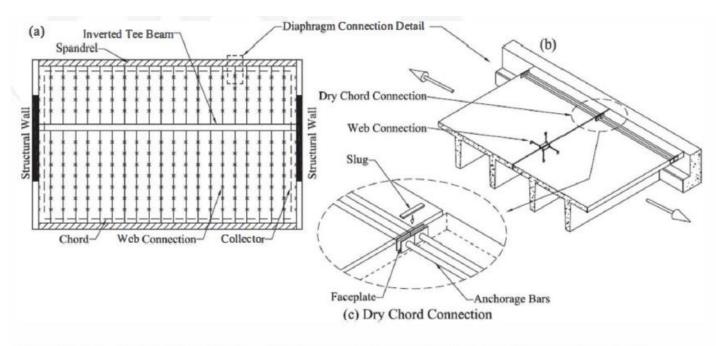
Typical double-tee diaphragm system with chord and web connections.
